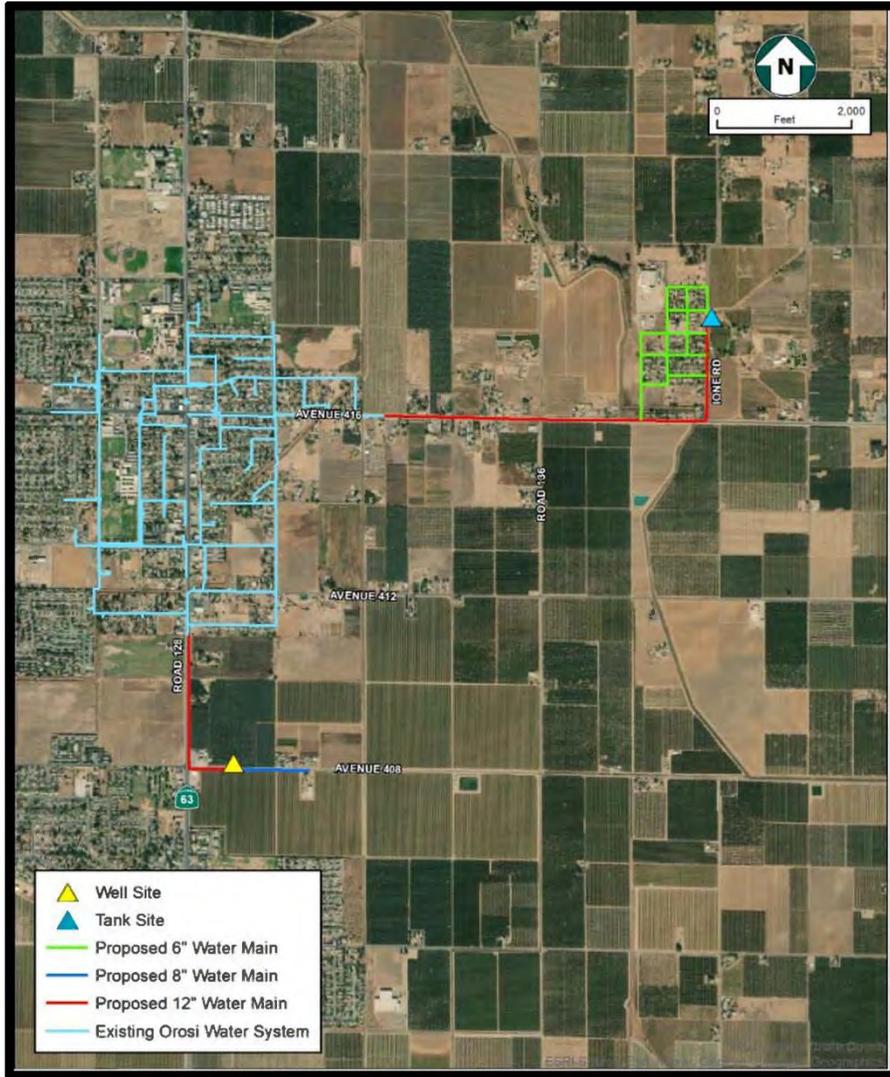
, will consist of 6, 8, and 12-inch water mains totaling 20,592 linear feet and will connect the replacement well and new tank to the existing Orosi Public Utility District (OPUD) pipelines. Well 2 will connect to the proposed 8-inch pipeline running east on Avenue 408 and to the proposed 12-inch pipeline running west of Avenue 408 and then north on Road 128 connecting to the existing OPUD distributions system. Well 1 will be connected to the new East Orosi distribution system. Once the new Well 2 is constructed, the existing Well 2 will no longer be needed and abandoned. The new Well 2 will be located on Avenue 408 and will draw water from 255 to 390 feet and will be 430 to 570 feet in depth with a maximum pump capacity of approximately 700 gallons per minute. All pumps and generators serving the well will be electric. The 300,000-gallon water storage tank will be installed south of Florida Avenue and east of Ione Road. The storage tank will include an electric booster pump to send tank water north on to Fruitvale into the new East Orosi community distribution system. This assessment evaluates project-related air emissions to determine whether the emissions fall below the significance thresholds, thereby having a less than significant impact on air quality.
